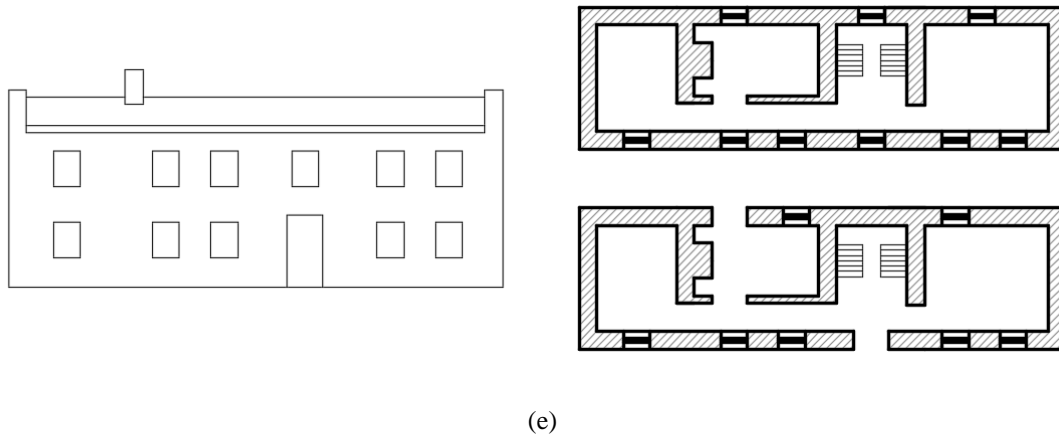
10. Traditional sizes and layouts of vernacular Irish buildings (elevation and plans): (a) one story two room house, (b) one and a half stories house, (c) three room house with diary, (d) two story house and (e) gentleman's house (ICOMOS UK Earth Structures Committee, 2000). (Continuation)
